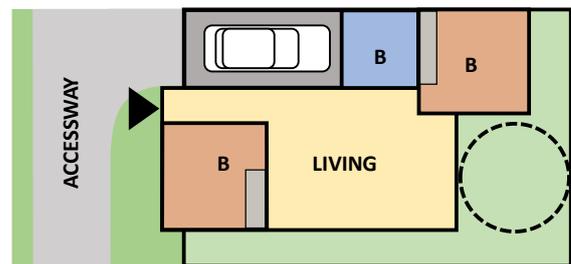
Example of a single-storey, two-bedroom dwelling with a garage.
